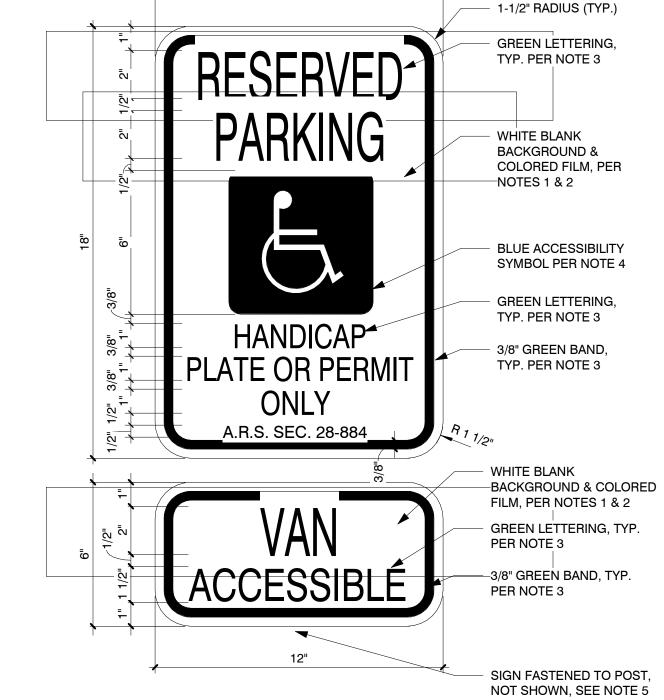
, AS SHOWN AND DIMENSIONED ON COM DETAIL M-23.06
